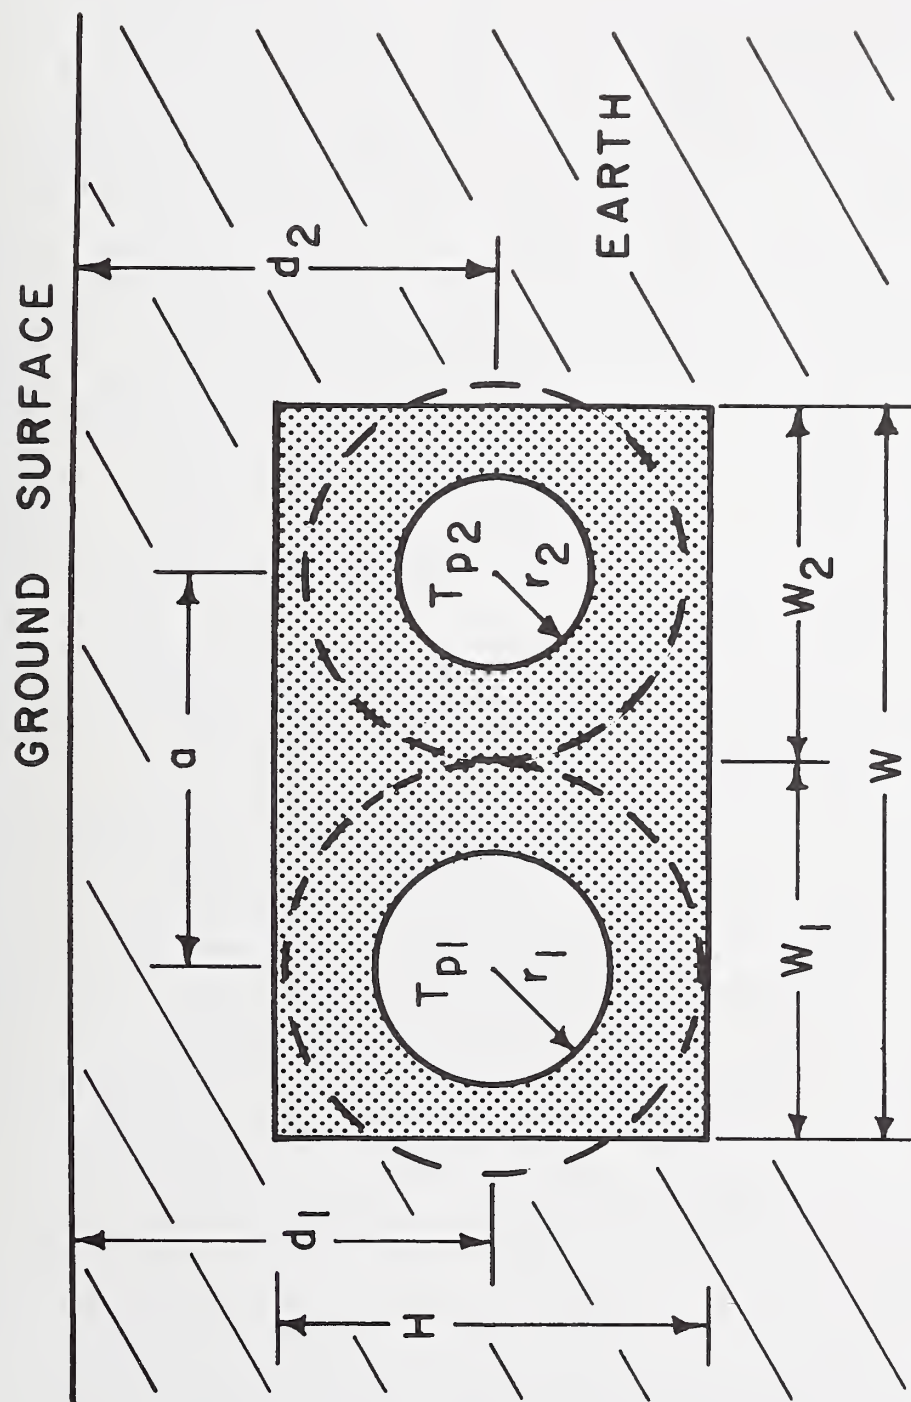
TWO UNDERGROUND PIPES IN AN INSULATED TRENCH
